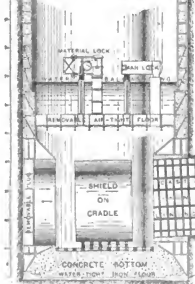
VERTICAL SECTION OF A SHAFT.
